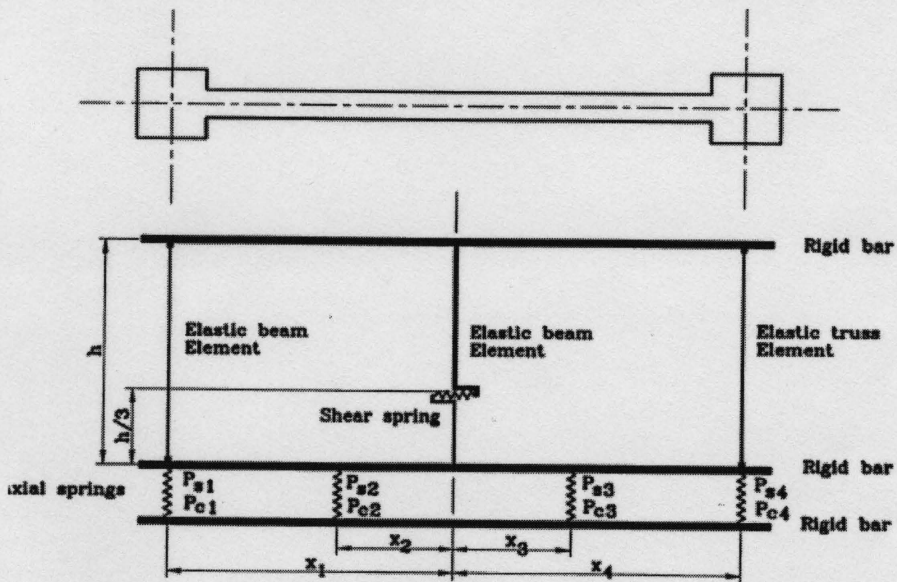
7 Reinforced concrete wall member model (Ghobarah and Youssef 1999).
